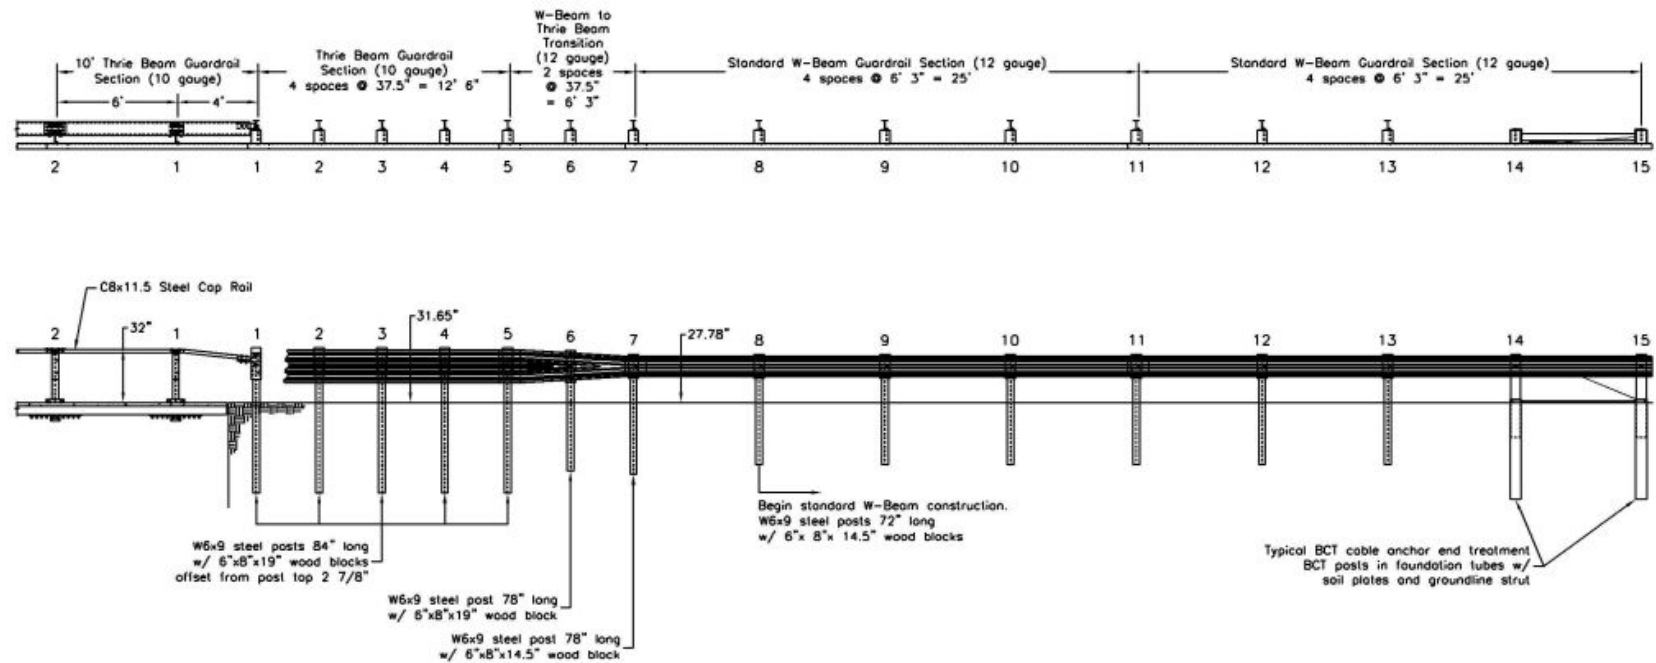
Overall Layout of Approach Guardrail Transition System - Steel System
